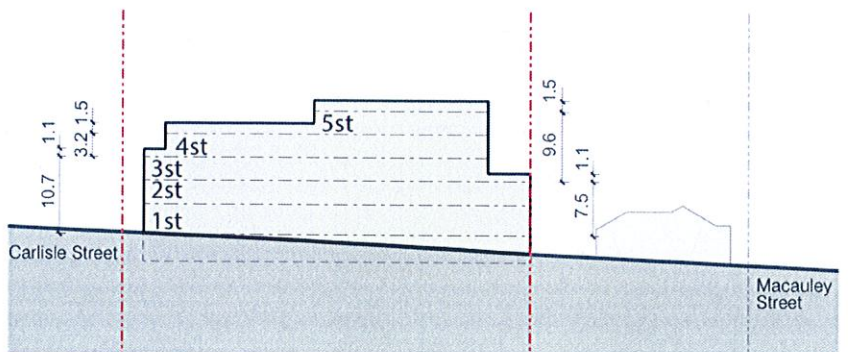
Norton Street _ Building envelope _ Section C-C
